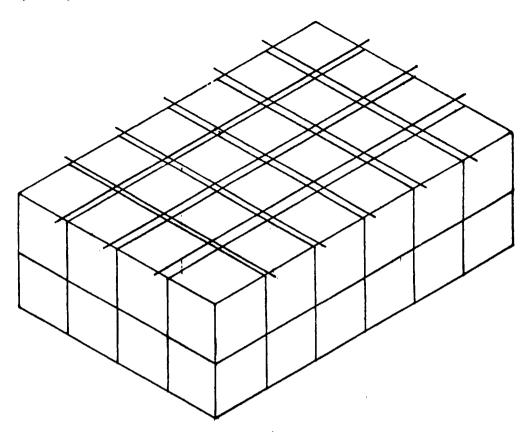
TYPICAL LAYOUT OF EXTERNAL STAY BAR SYSTEM FOR SUPPORTING PANELS
